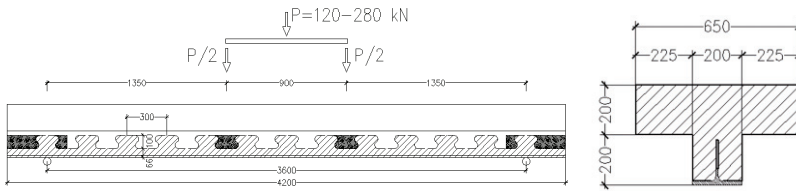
Side view and test setup of considered beam (left) and cross section (right)
